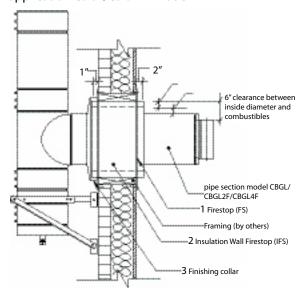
Typical Insulated Wall Firestop (IFS) installation for exterior wall application CBGL/CBGL2F model
